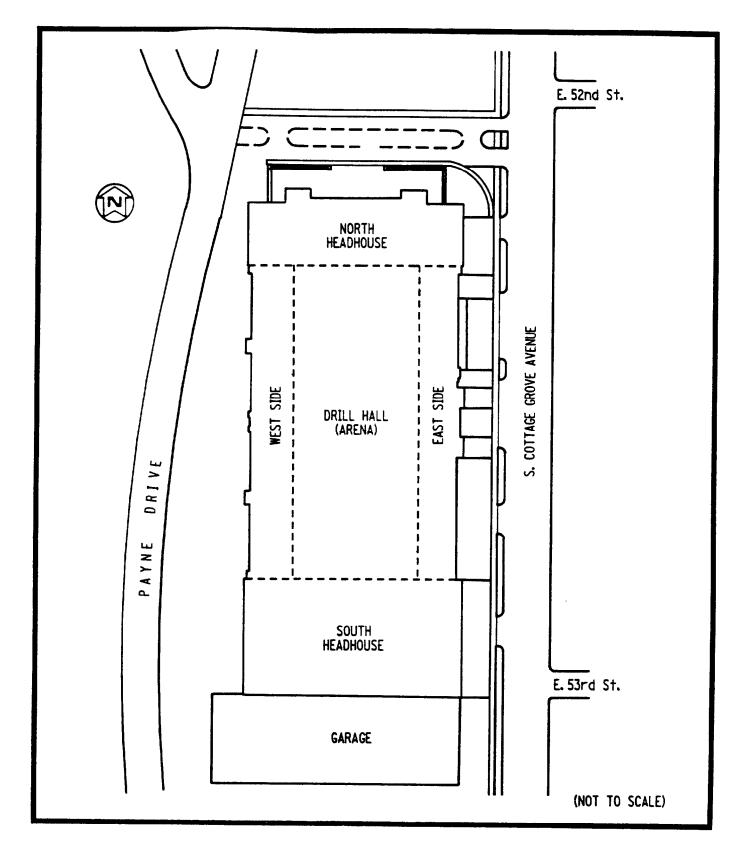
GENERAL FLOOR PLAN OF THE NGA
